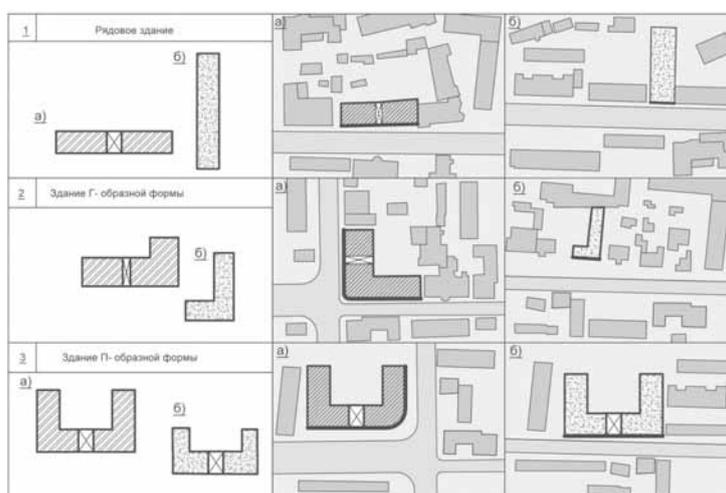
Tenement buildings classification scheme based on the general principles of space planning structure building.
